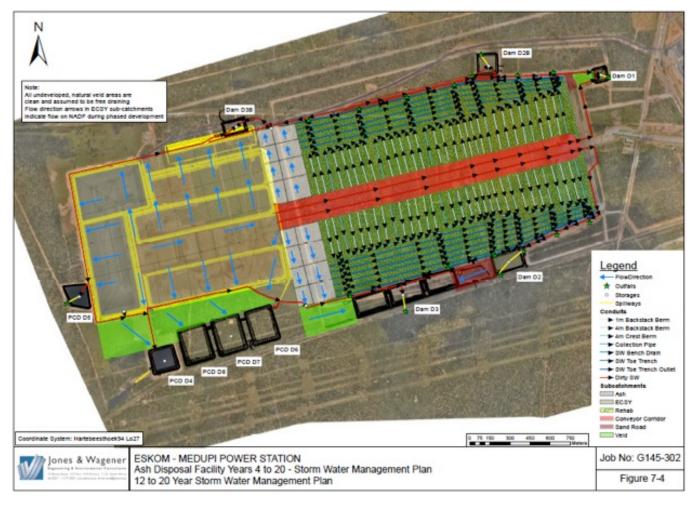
Existing and licensed ADF as well as the associated dams and proposed storm was management plan
